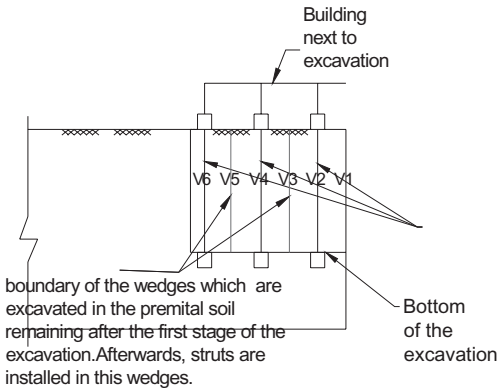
The longitudinal cross section of studied excavation and consequence of strut installation in procedures (1) to (4).
